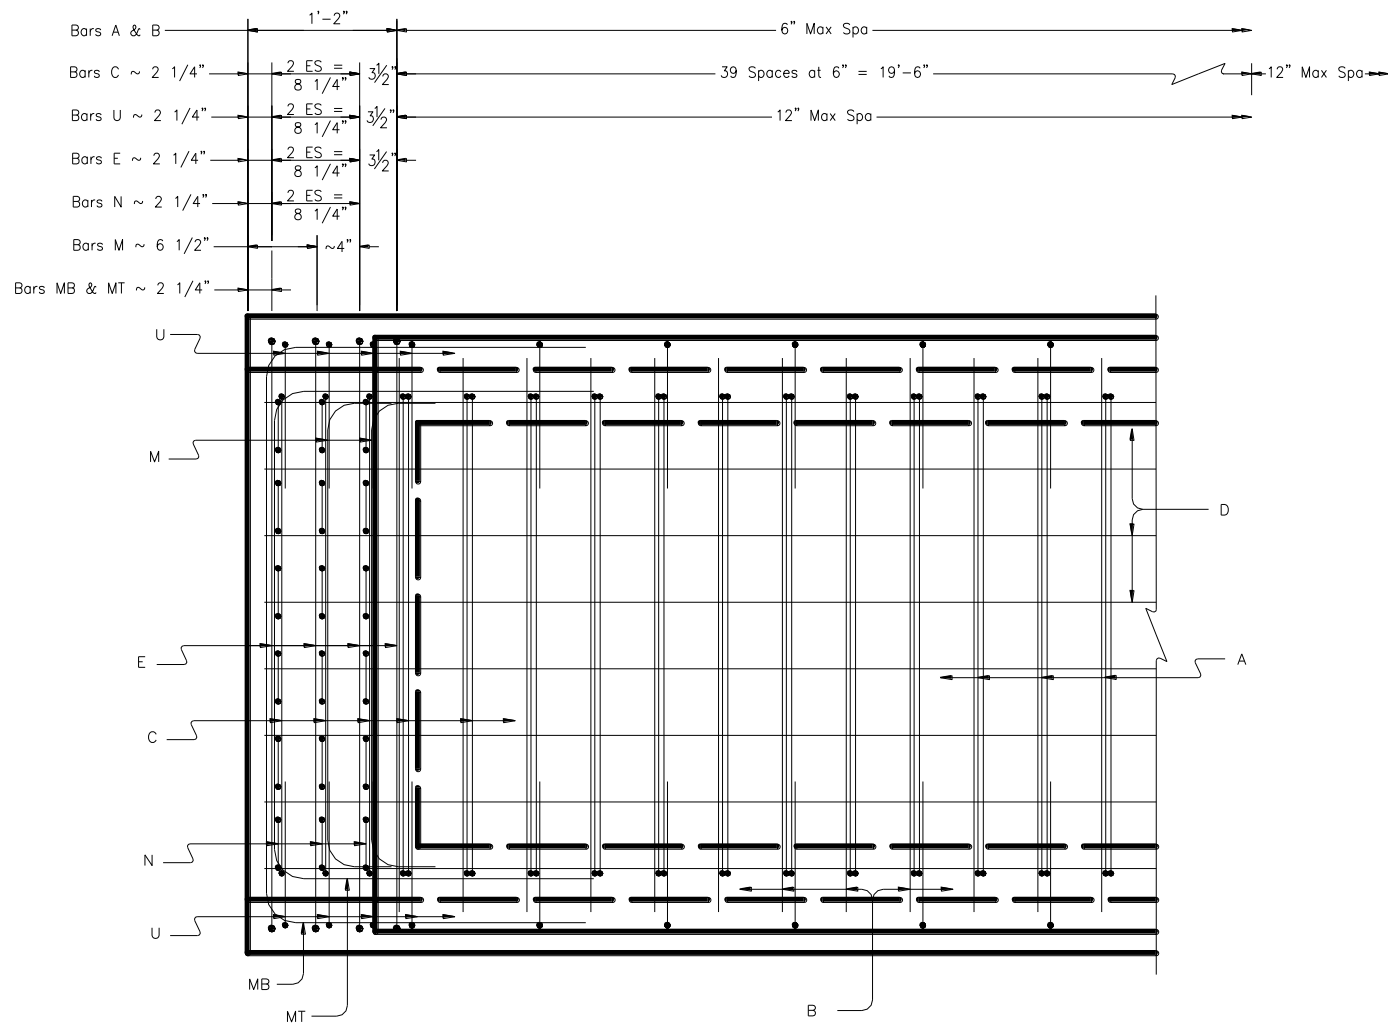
Partial Plan – Square End. Beam 5B40-4
